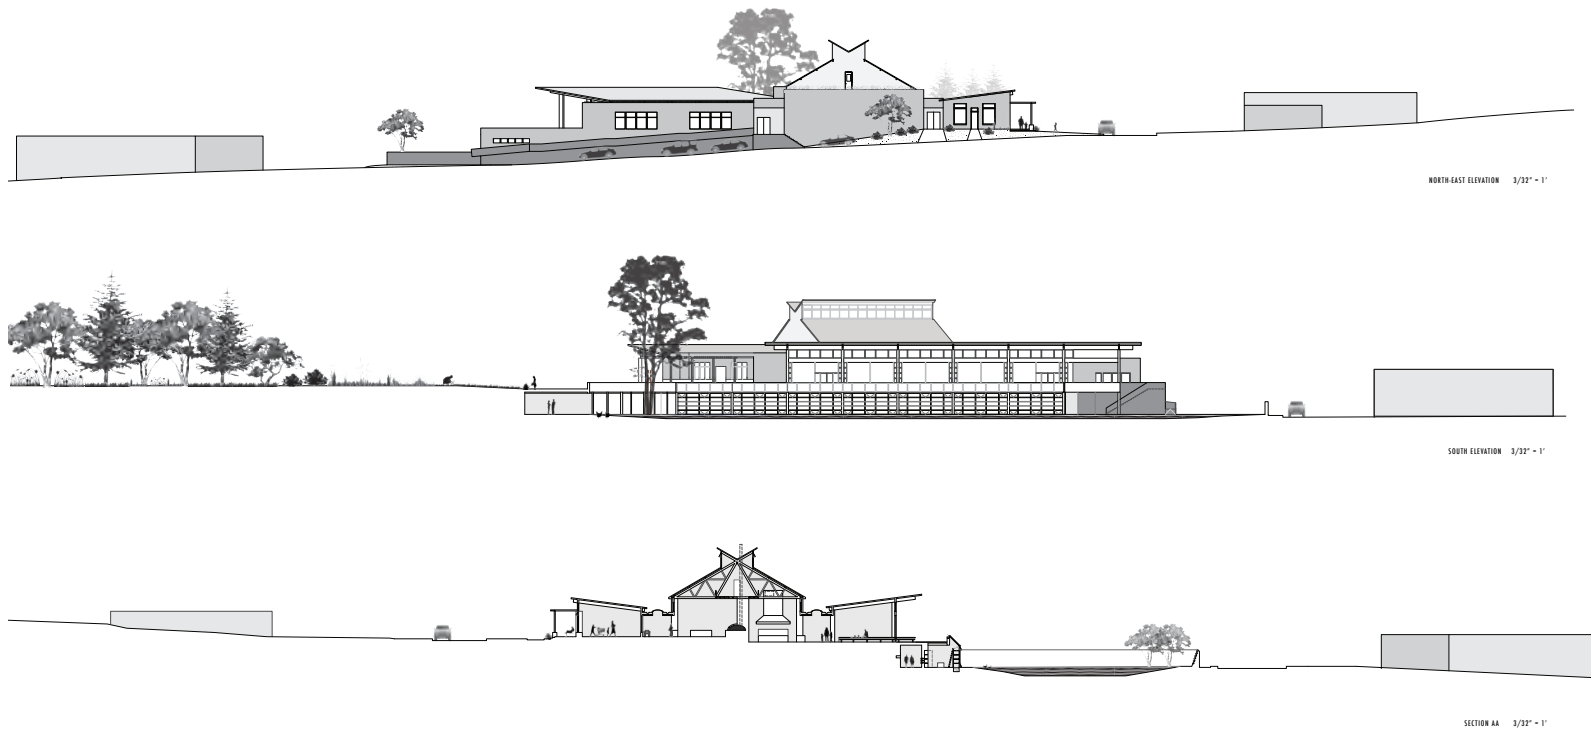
Five Points Community Food Center Sections and Elevations 2. (Author).
